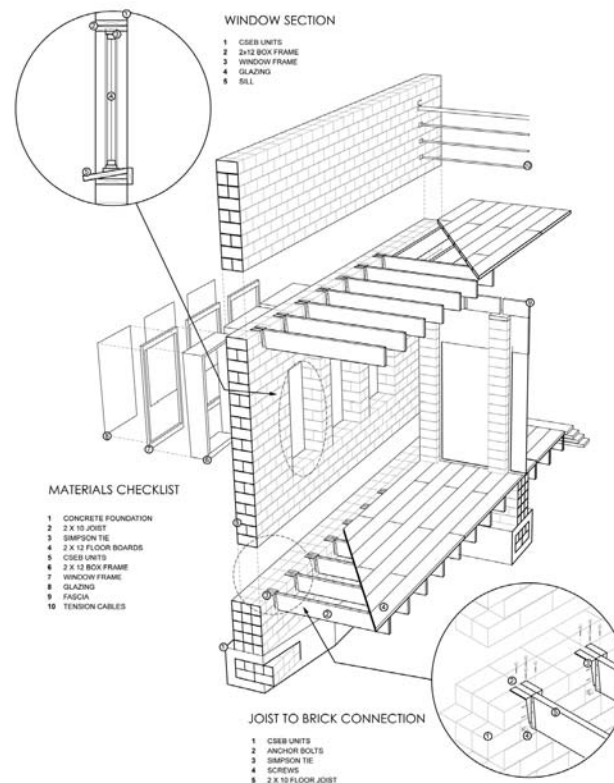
Housing prototype typical foundation, floor, wall, roof, and opening assemblies. Source: (Author)
